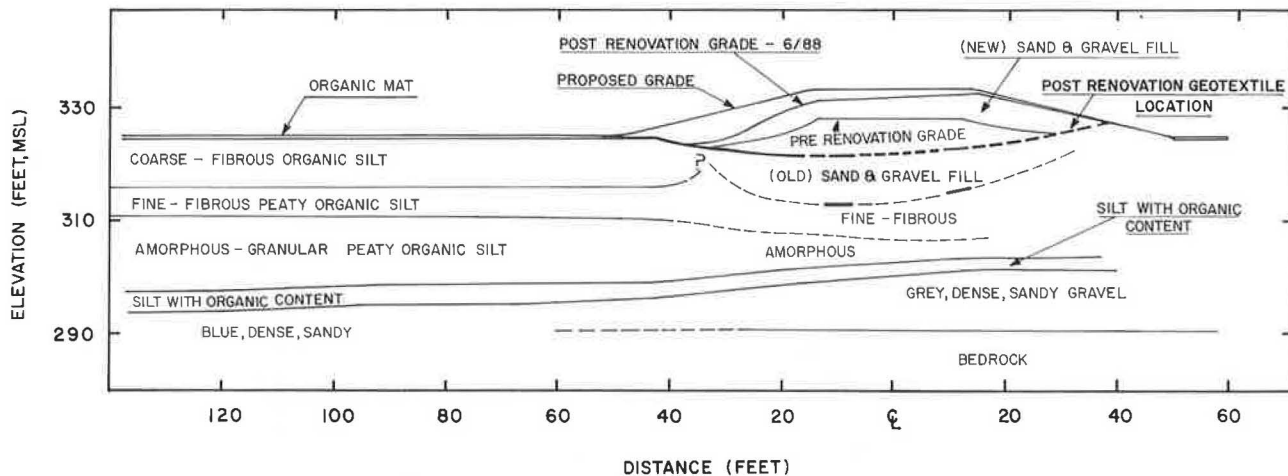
Cross-section of the New Boston Road embankment at STA 101+50 as of July 1988.
